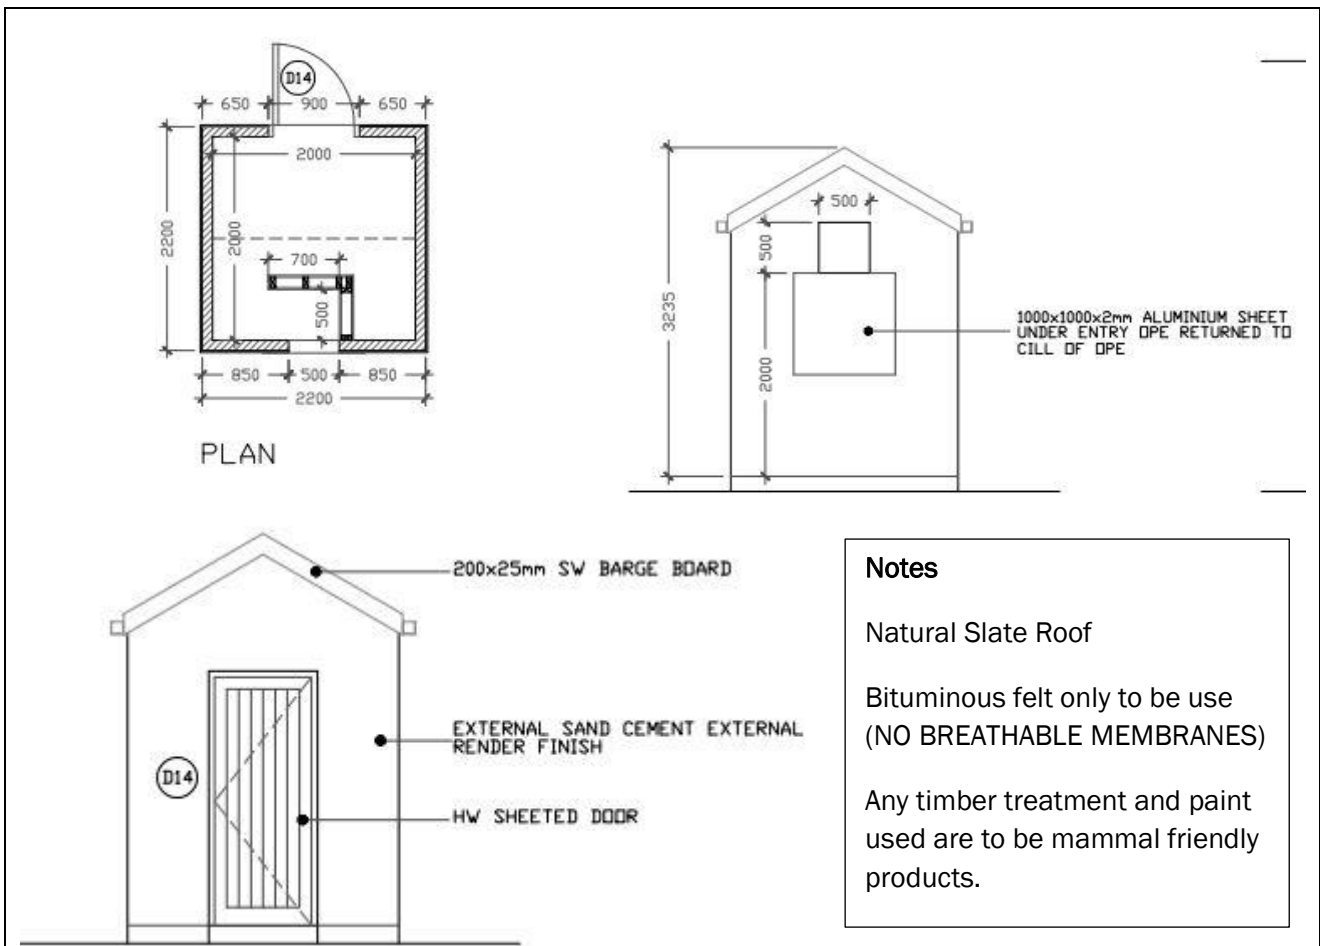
Plate A: Day Roost – front and rear views of Night Roost described in plans.
